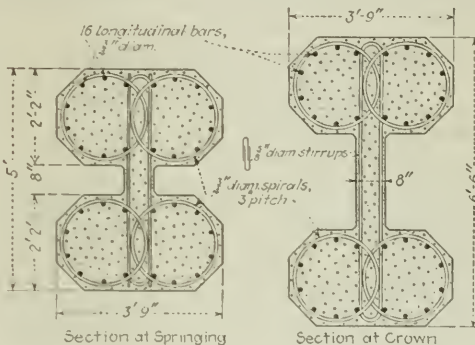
SECTIONS OF RIB AT SPRINGING AND CROWN, MAUTIT RIVER BRIDGE AT NANTES
